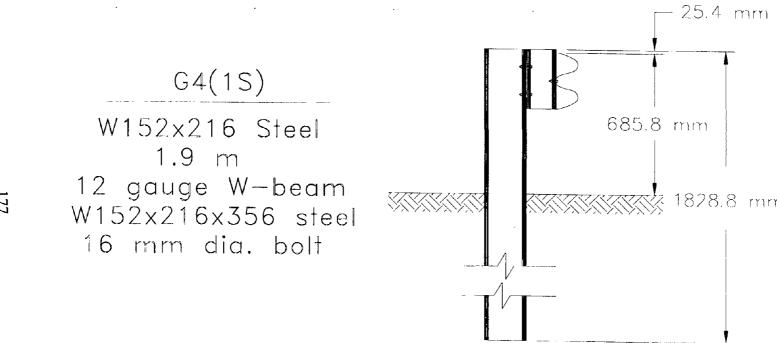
Cross-section of the W-beam, steel-post (G4(1S)) guardrail system.
